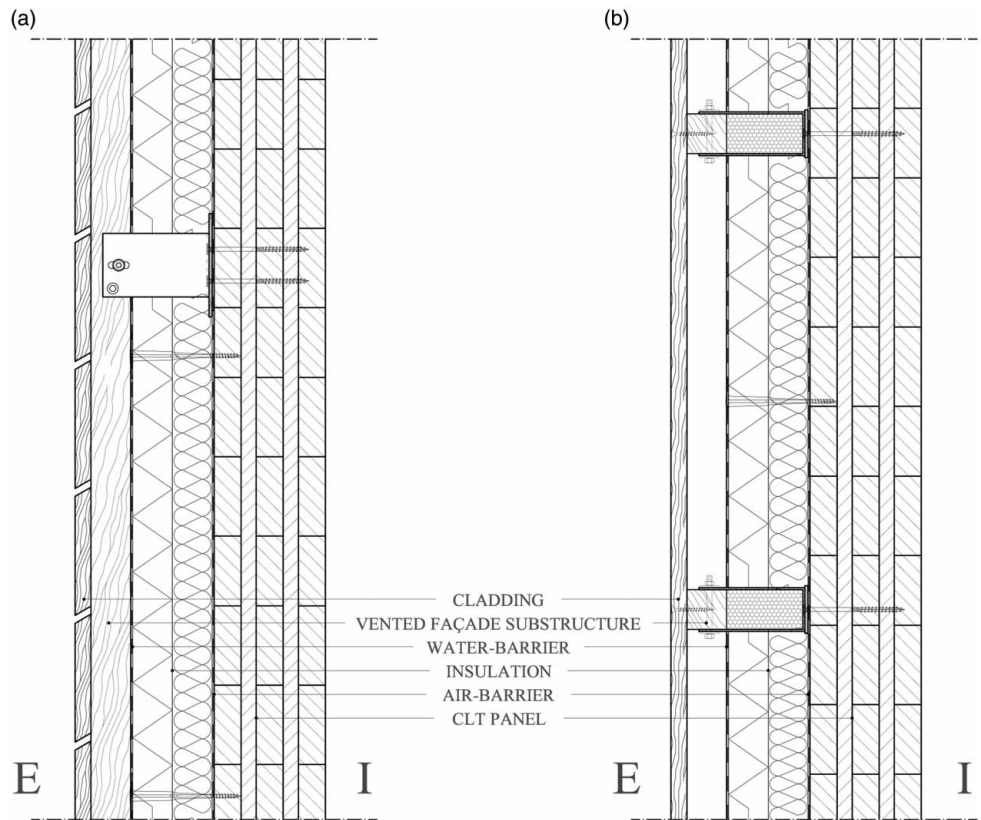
(a) Vertical cross section. (b) Horizontal cross section.
